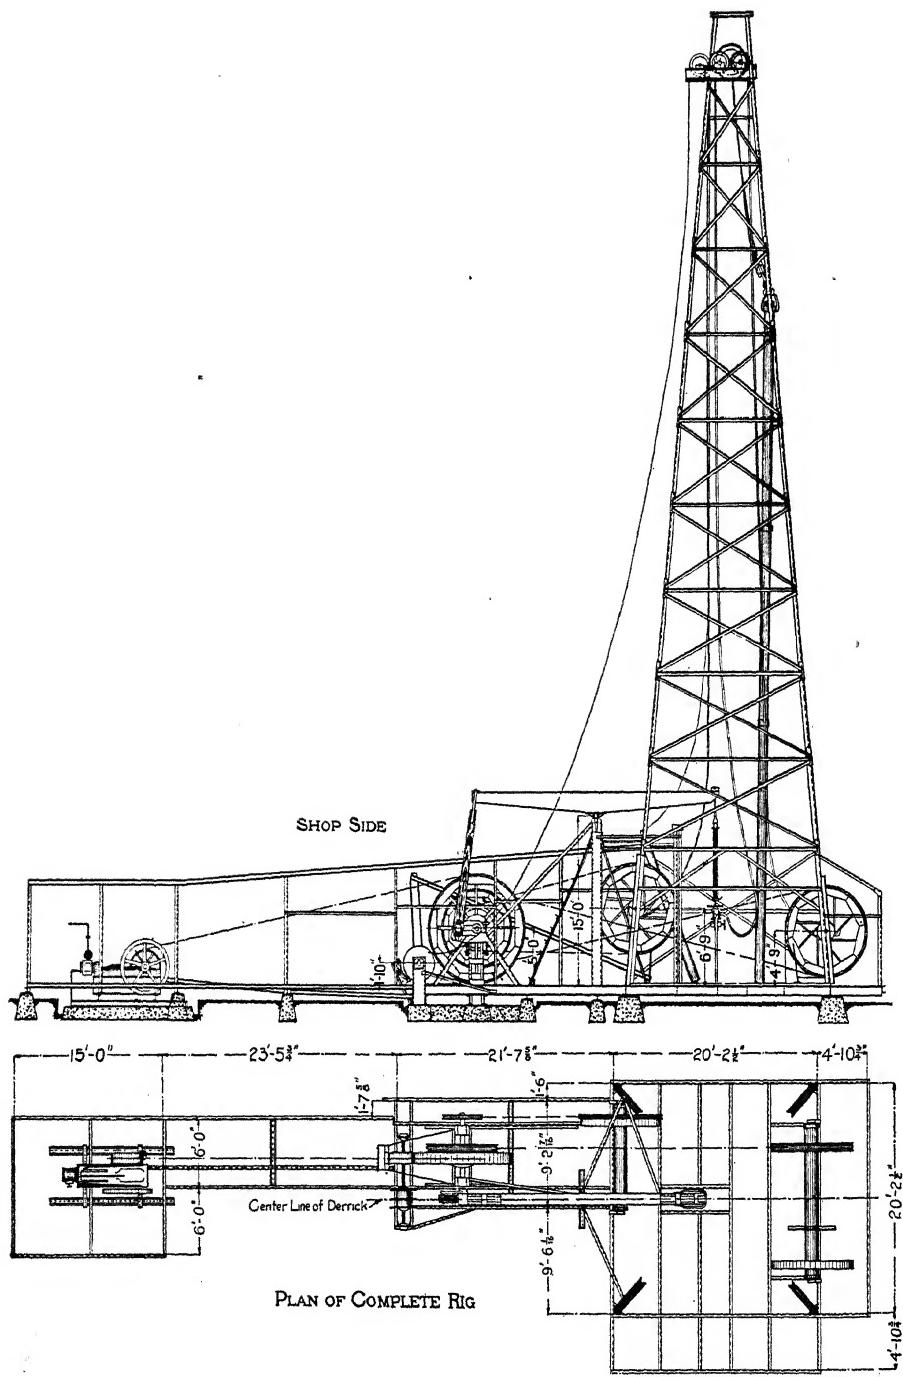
B.—80-FT. WOODWORTH CALIFORNIA DRILLING RIG. THE COMPLETE MODERN STRUCTURE.
